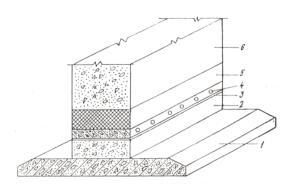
Strip foundation with thermoplastic elements. 1 – cushion; 2 – pedestal block; 3 – thermal insulation; 4 – heating element; 5 – thermoplastic element; 6 – basement wall.
